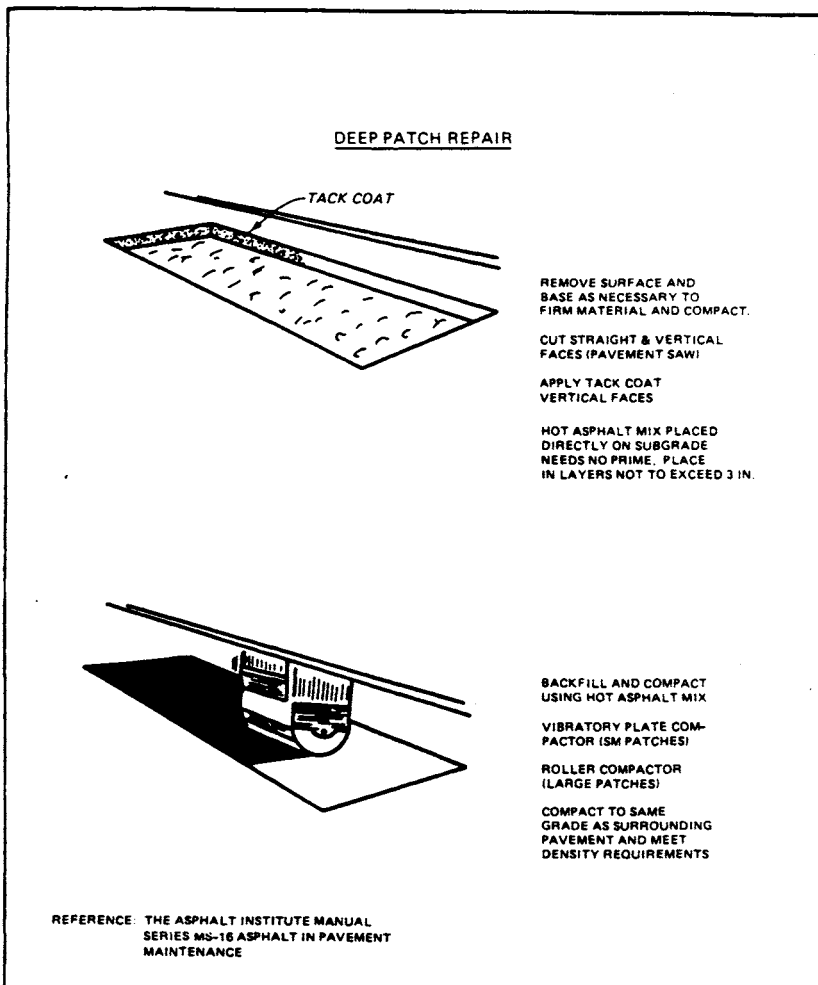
Full-Depth Patching of AC Pavement (Air Force 1992).
